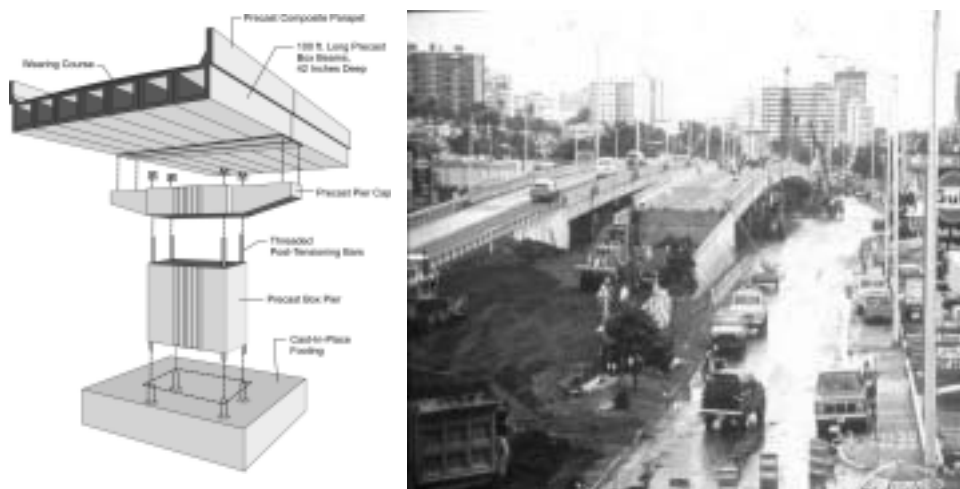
Precast piers at Louetta Road Overpass on State Highway 249 near Houston, Texas.
